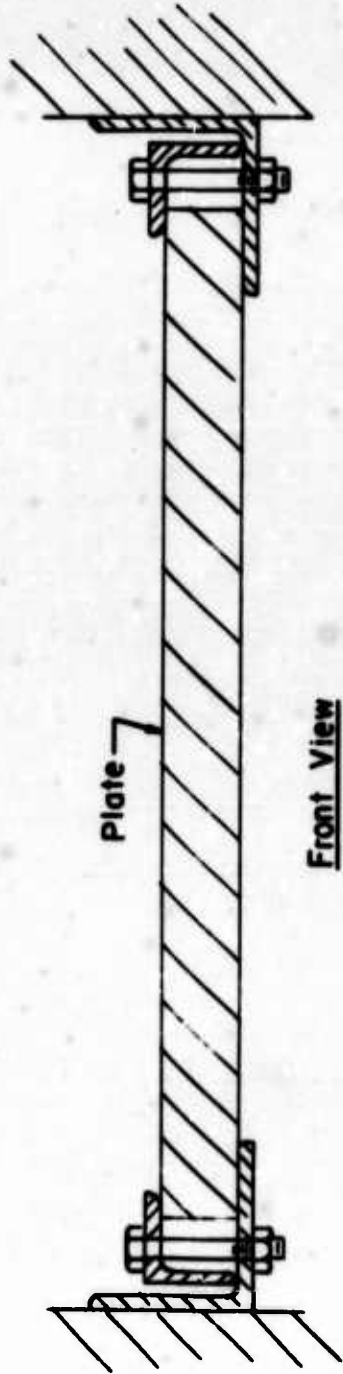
FLAT PLATE MOUNTING DETAIL
